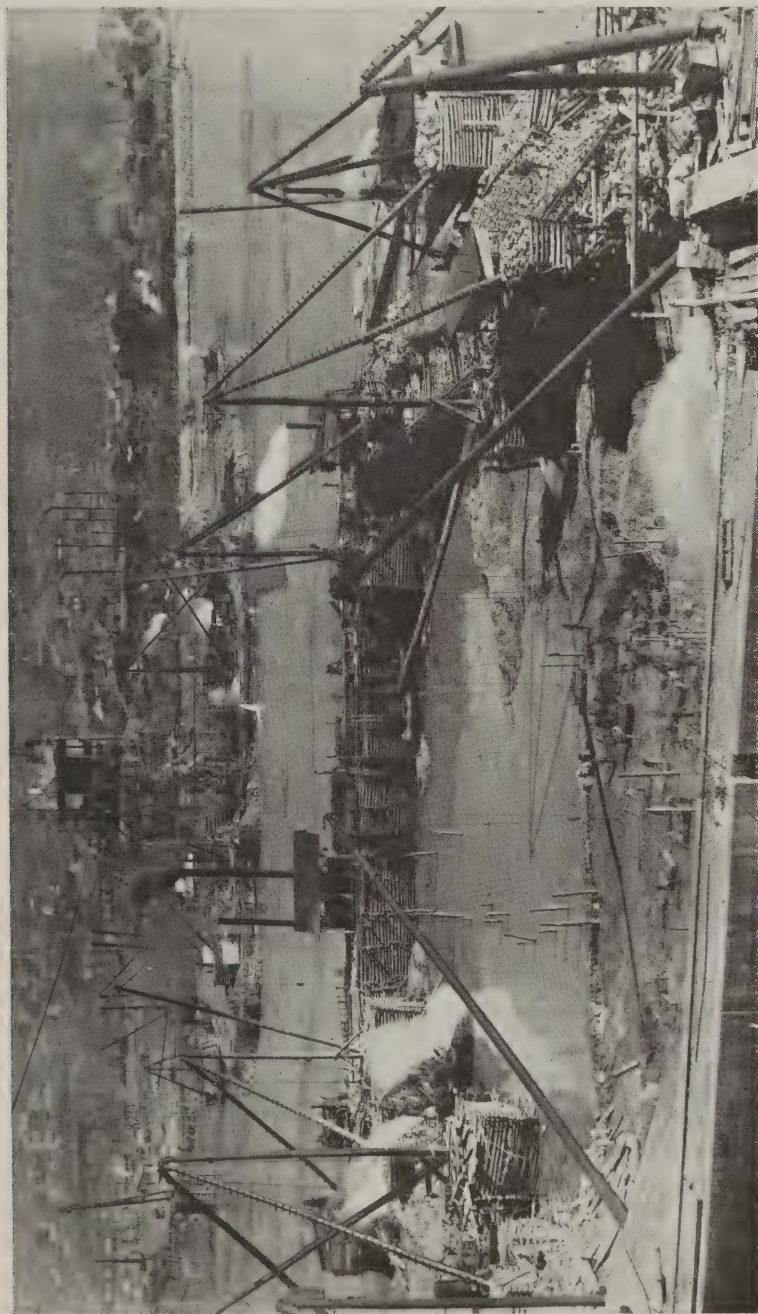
General view of plant and site at Hales Bar, Tennessee River, from lock wall.
